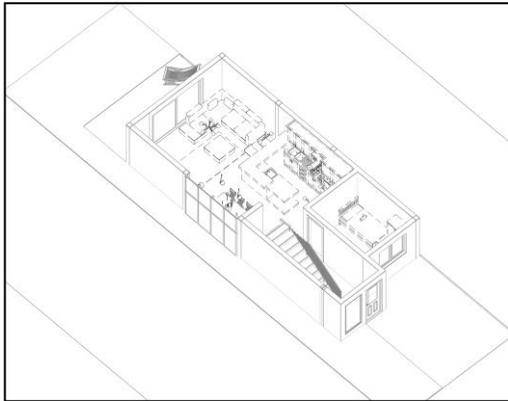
Ground floor 3D plan in stage three – dashed lines show demolished elements
